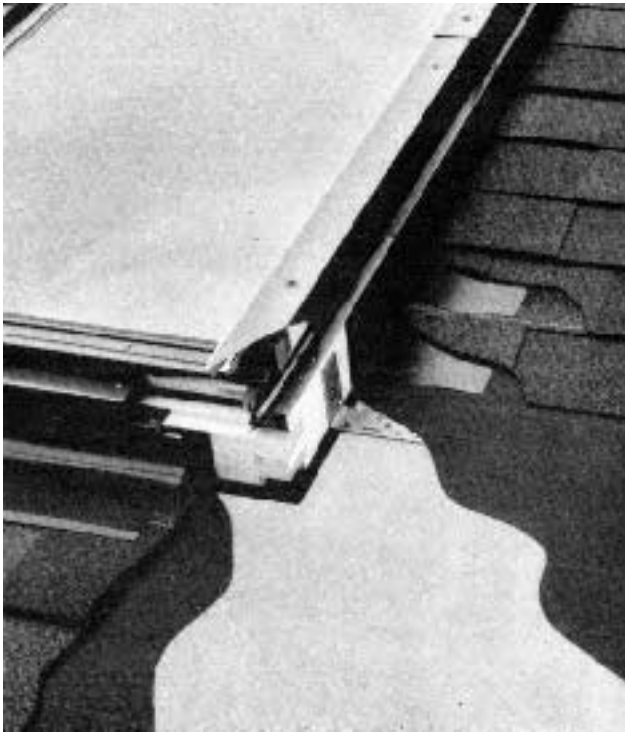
The Velux roof window mounts on angle brackets. Brackets, step flashing, head and sill flashing, and counterflashing are anodized for longer wear.
